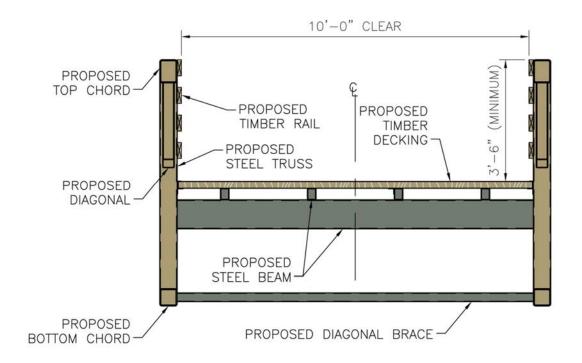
Alternative 2 - Replacement with Prefabricated Steel Bridge Structure Cross Section
